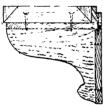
Section of Lower Part of Corner Bracket (see Fig. 1199).
